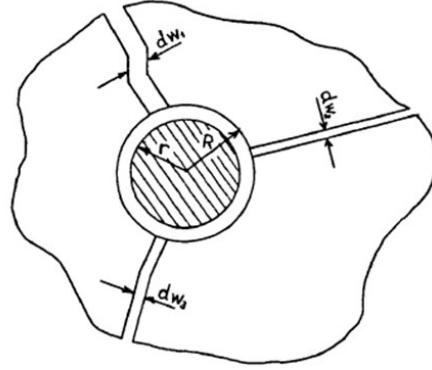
Cracking of concrete due to dilatation of reinforcing steel [2].
